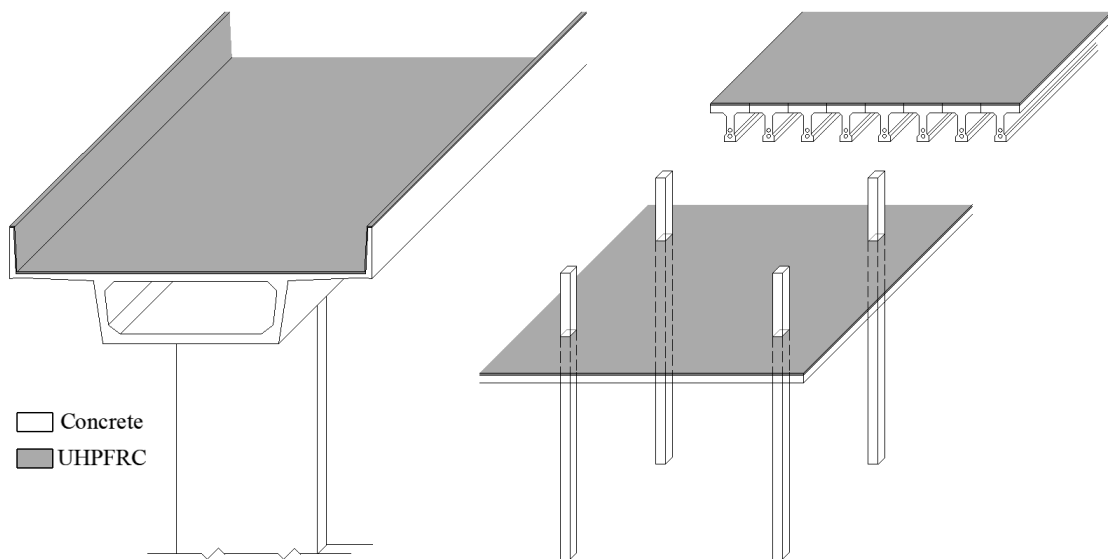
Structures submitted to combined bending and shear: (a) cantilever on a box girder bridge; and (c) flat slabs on columns (Bastien-Masse and Brühwiler 2016b).
